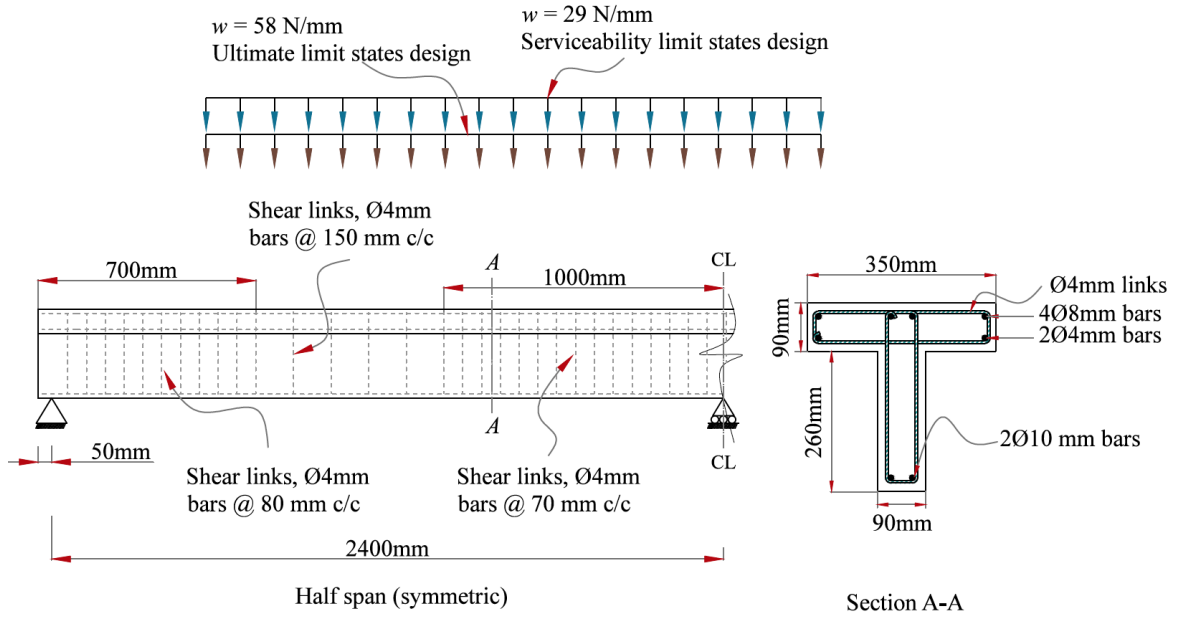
Geometric and reinforcing details of beam T-N-C
